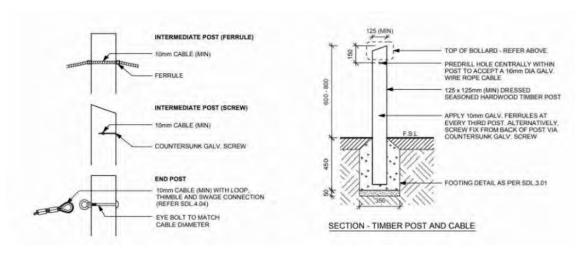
Typical proposed timber post and cable fencing. (Source: Design Table Landscape Architecture and Urban Design 9 April 2021)
